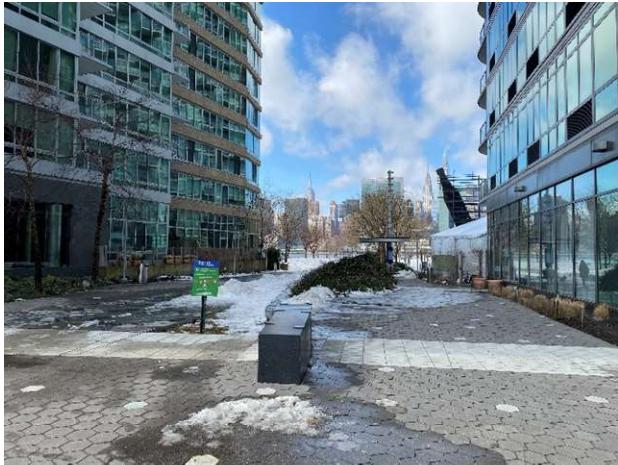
View of the landscaping and park facing west in between 46-30 Center Blvd. and 46-10 Center Blvd. (C241096 an V00505B)
